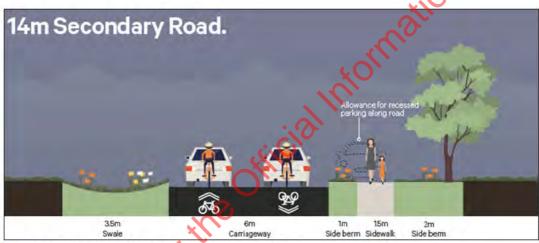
Proposed Cross Section – 14m – Road B, Road C and Road D Source: Isthmus
